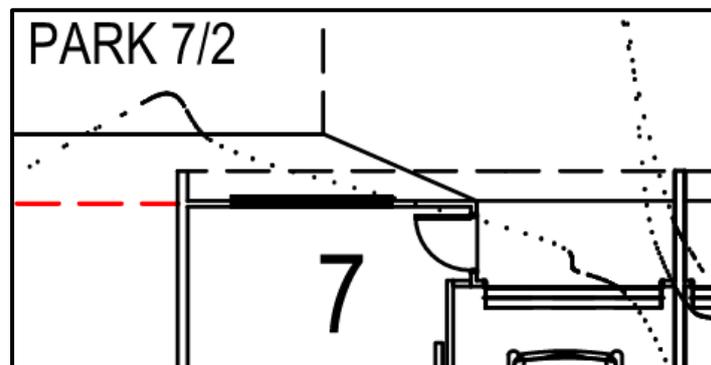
Unit 7 site plan for 21 Coleman Street, Moonah.
